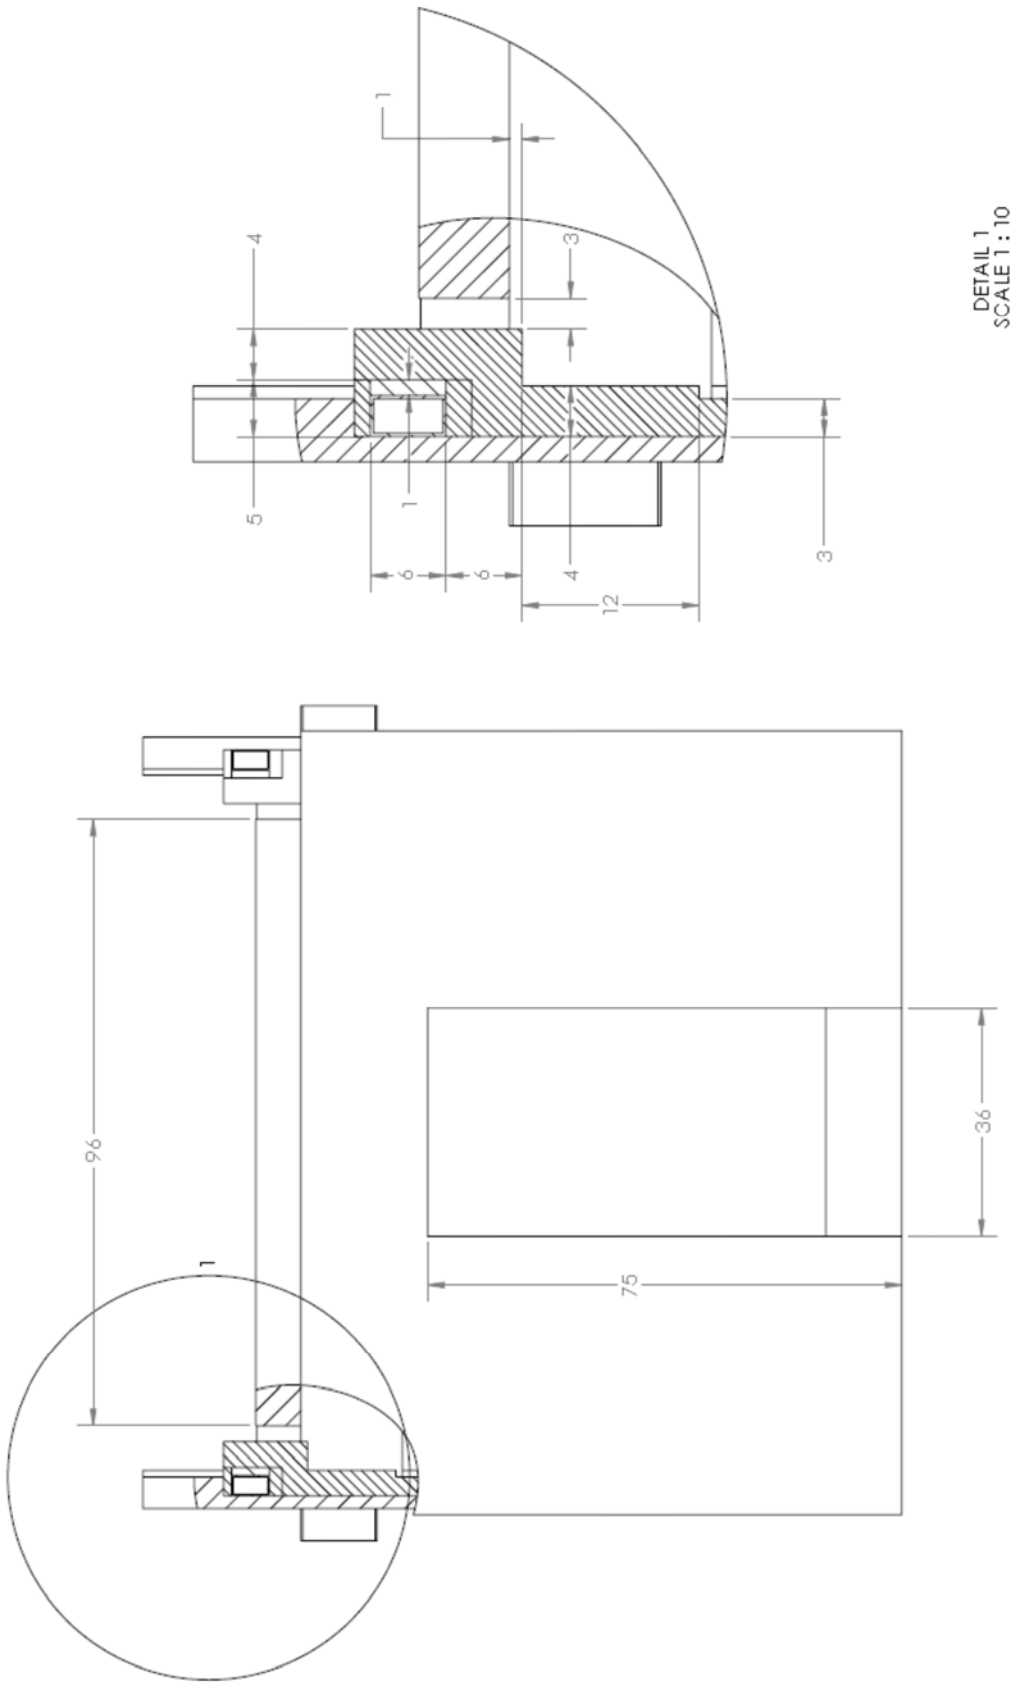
Front Elevation and Construction Detail to Narrow Gap along Sides of CLT Sample (Units in inches)
